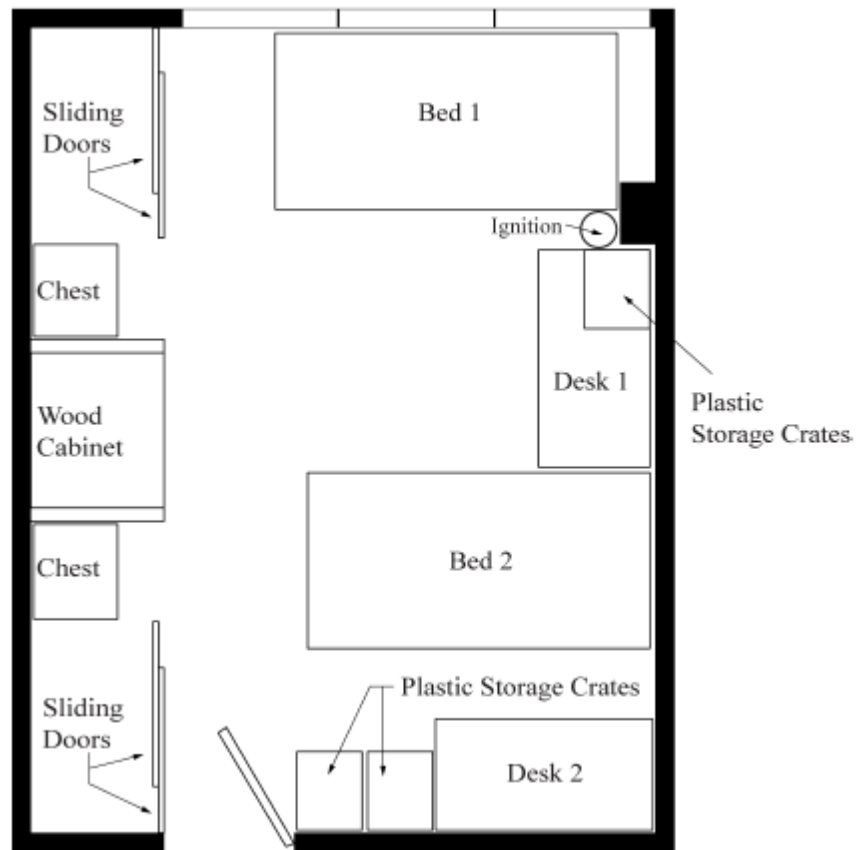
Schematic of contents of a sleeping room in the dormitory building (Madrzykowski and Walton, 2010)
